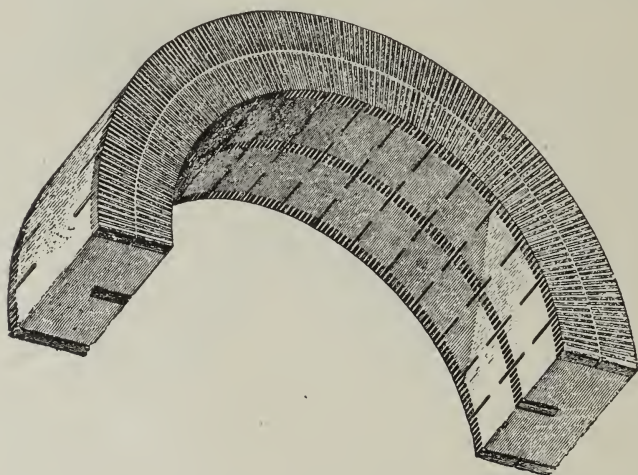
Roman Method of Brick-and-concrete Vault Construction.
